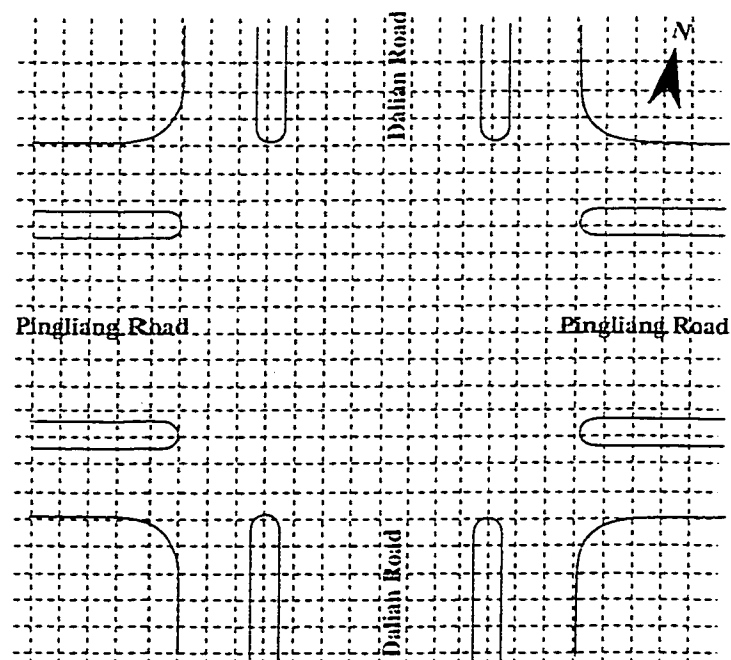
Plan of Shanghai case intersection with a 2-m grid
